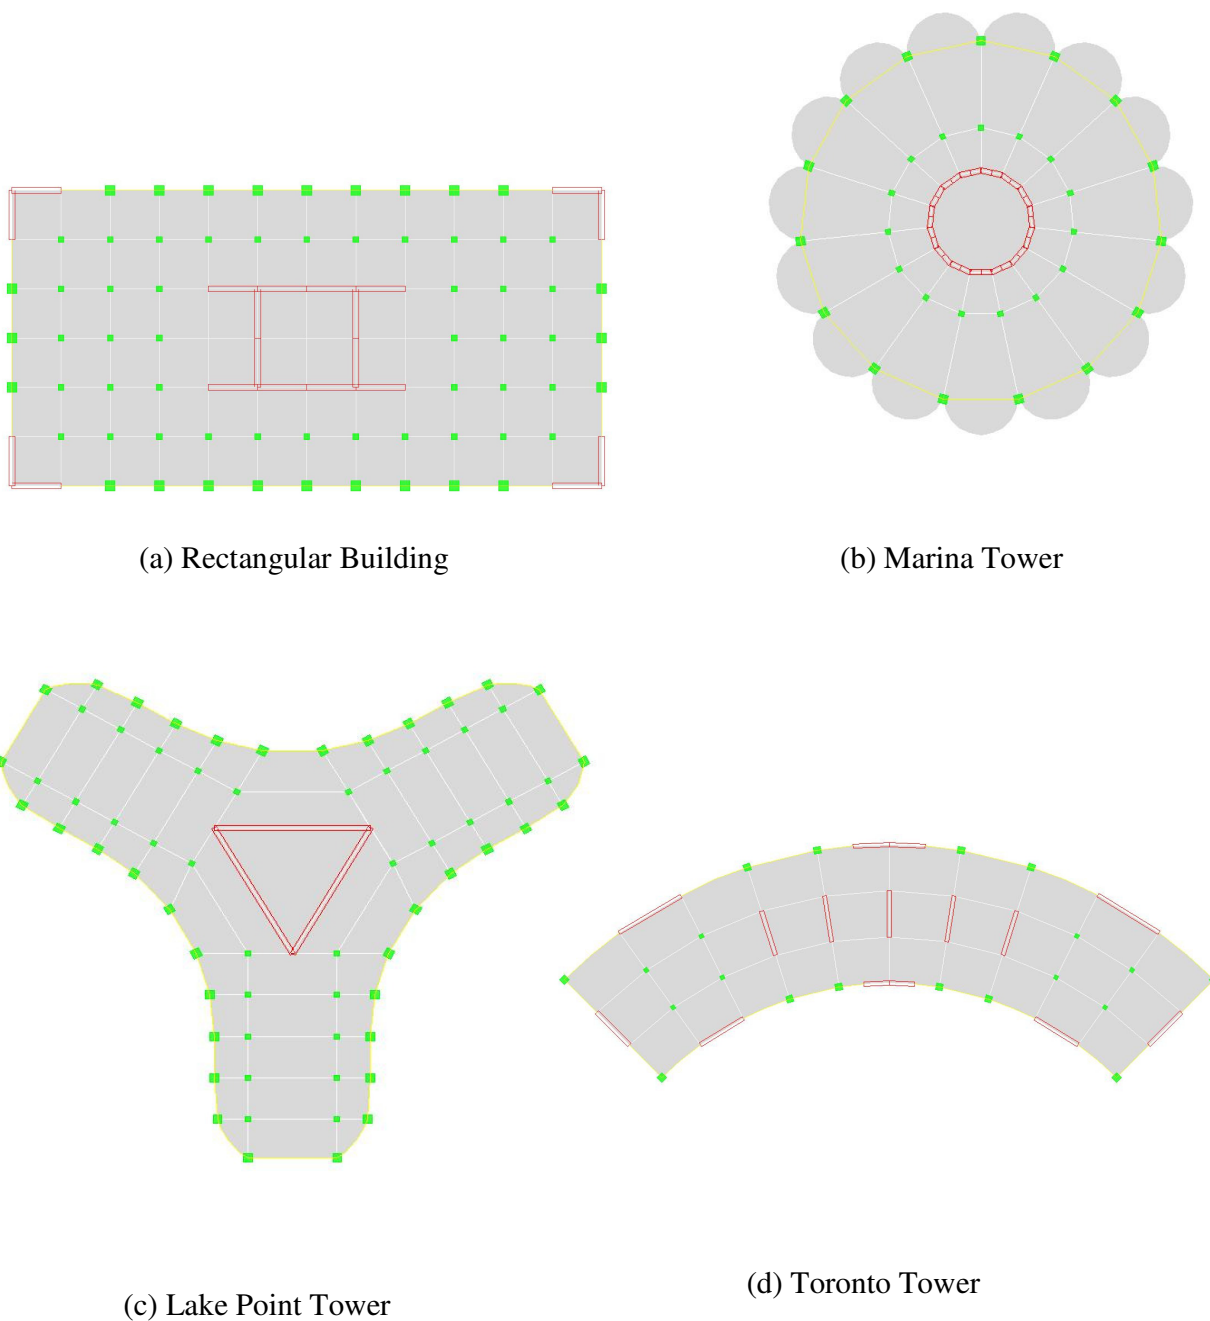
Frame-Shear Wall (*DS*) System for Different-Plan Buildings
